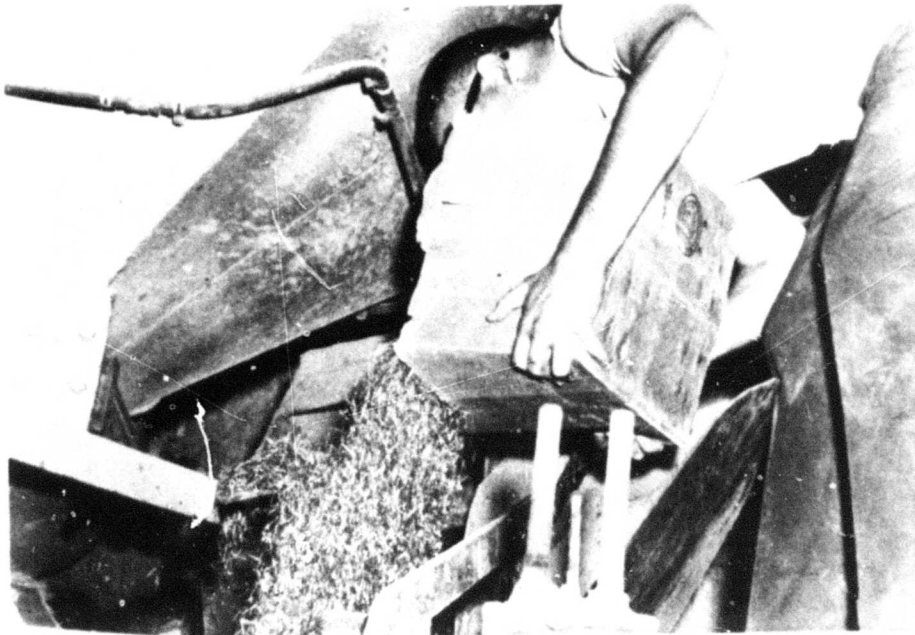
Method 3 Used to Introduce Steel Fibers in the Concrete Batching Operation
